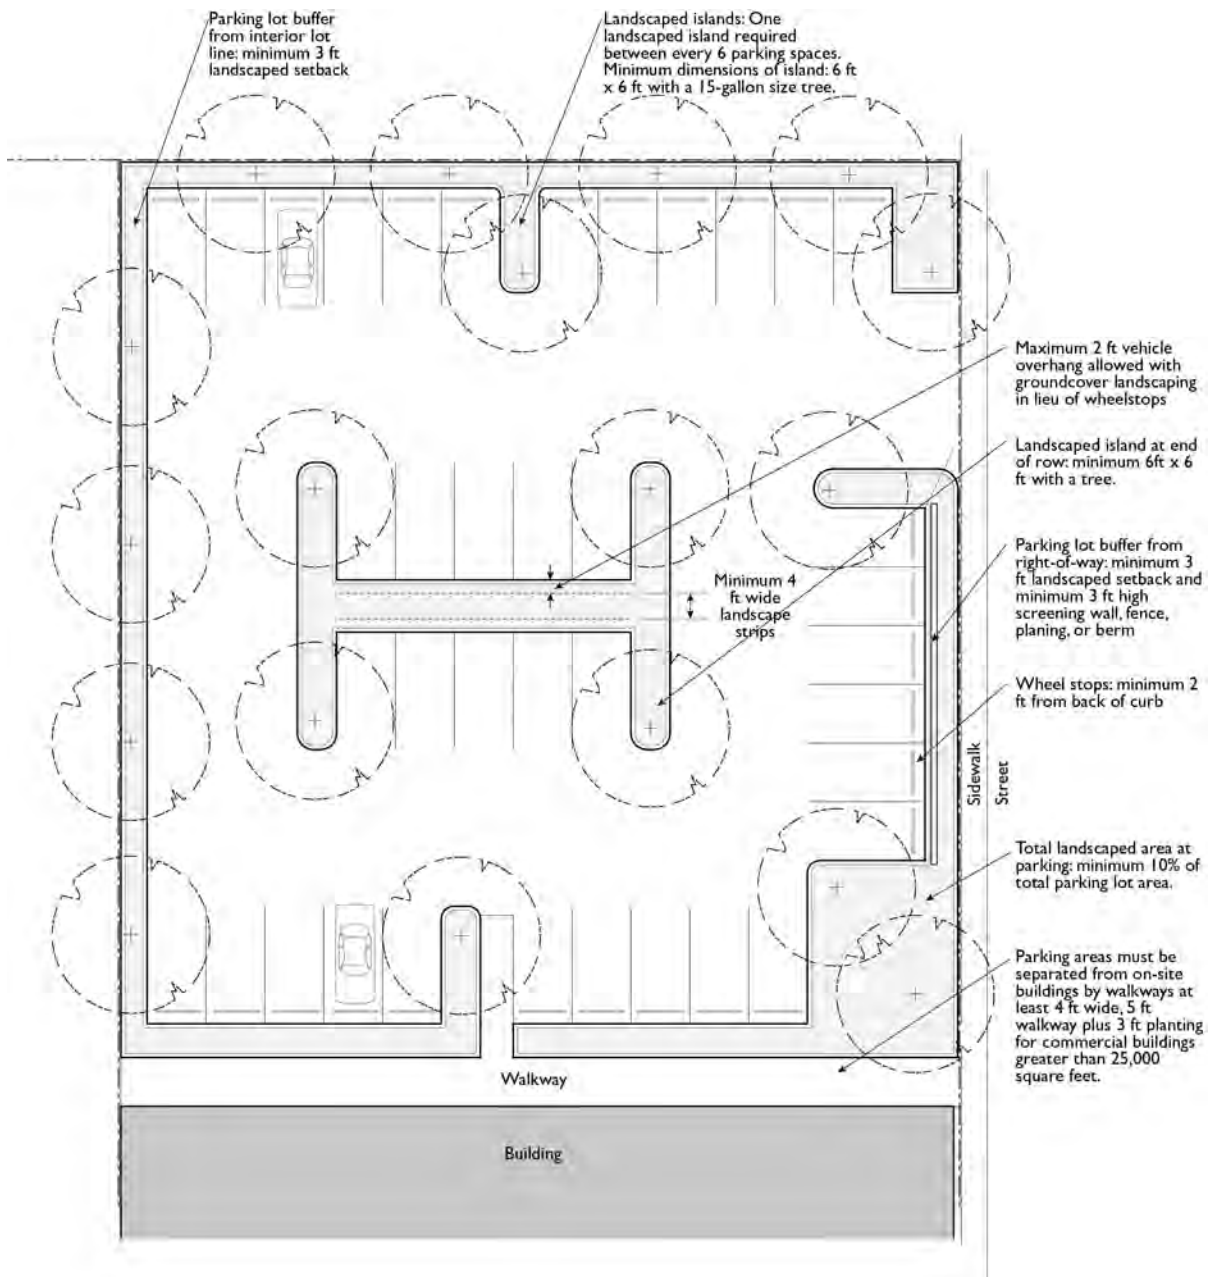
M: SEPARATION FROM ON-SITE BUILDINGS
